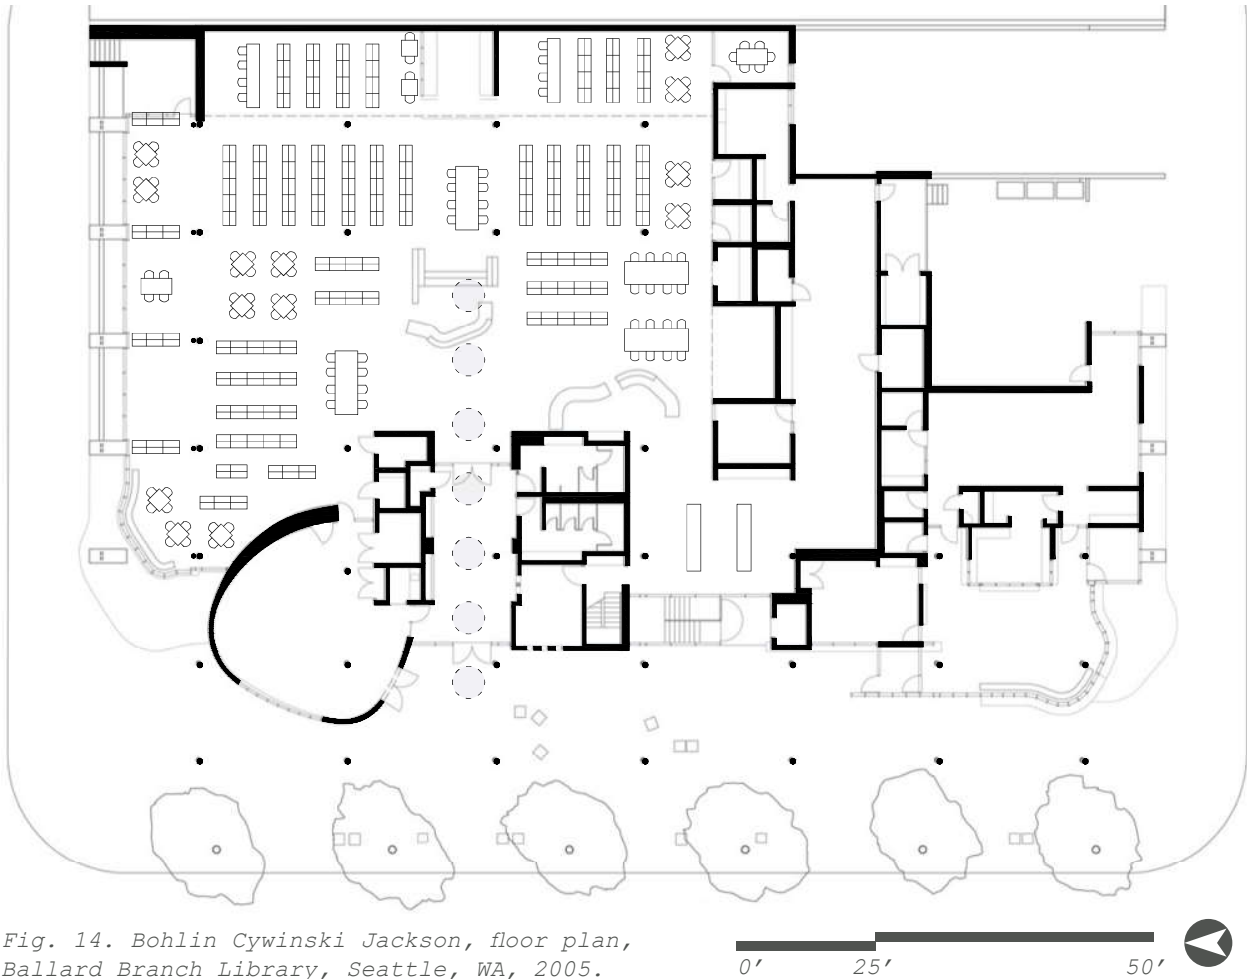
Bohlin Cywinski Jackson, floor plan, Ballard Branch Library, Seattle, WA, 2005.
